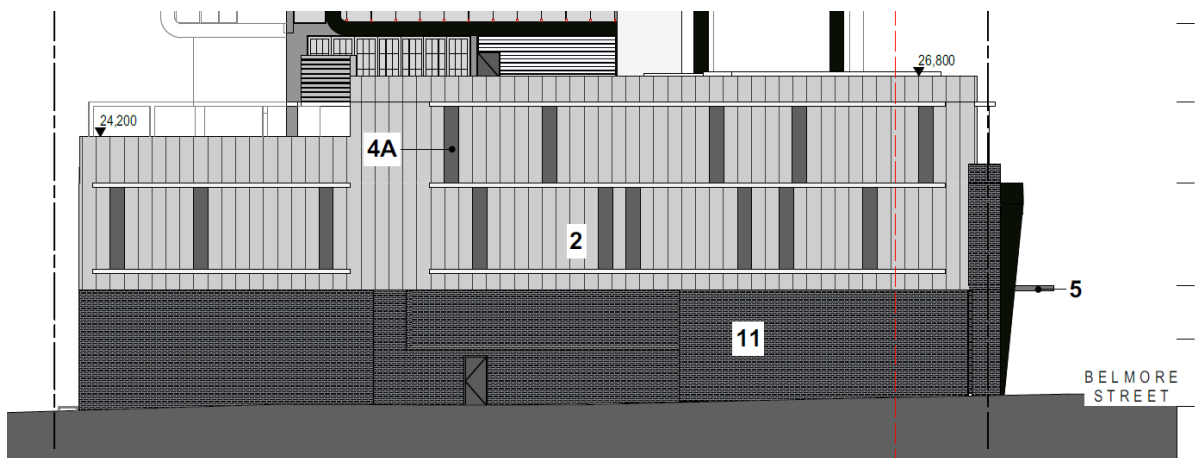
Revised southern elevation (adjoining 22 Belmore Street which is likely to be redeveloped in the future)
